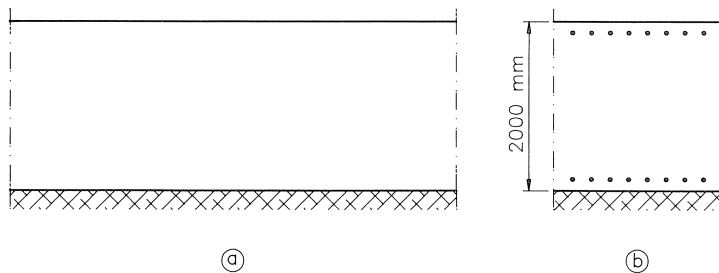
Concrete foundation; Side-view (a) and cross-section with the reinforcement (b) [Helmus, 1989].
